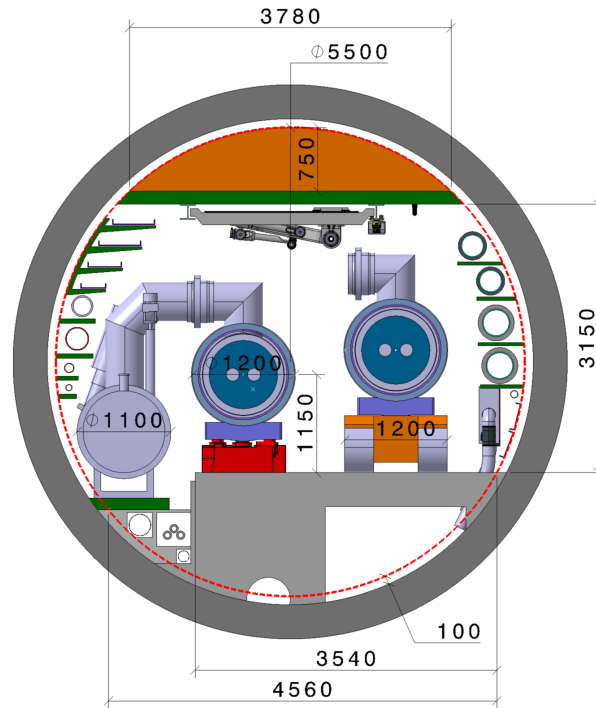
Cross section of the FCC-hh tunnel in the arcs.
